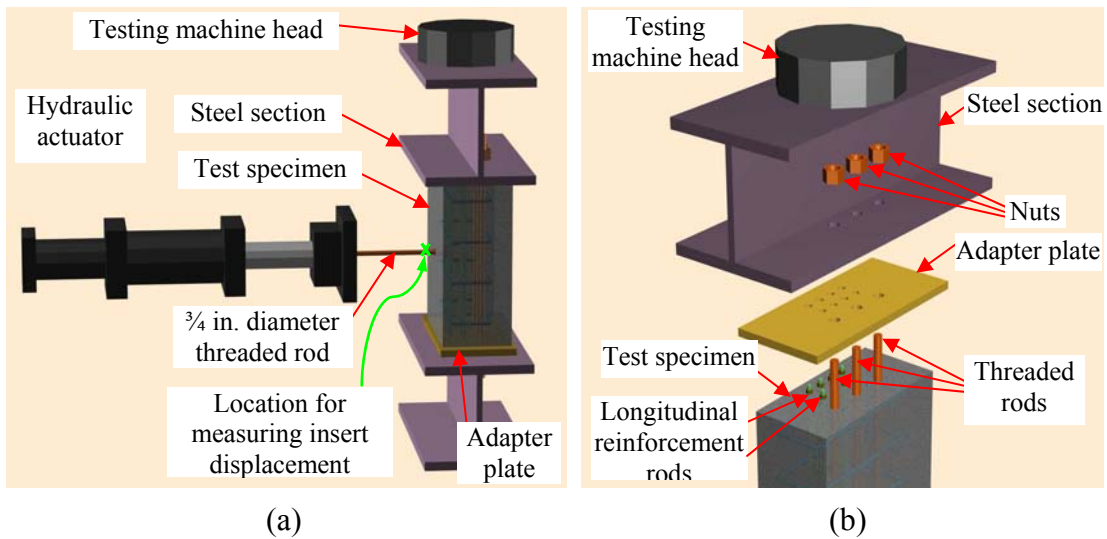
Pull-out test setup: (a) overall view; (b) top connection detail.
